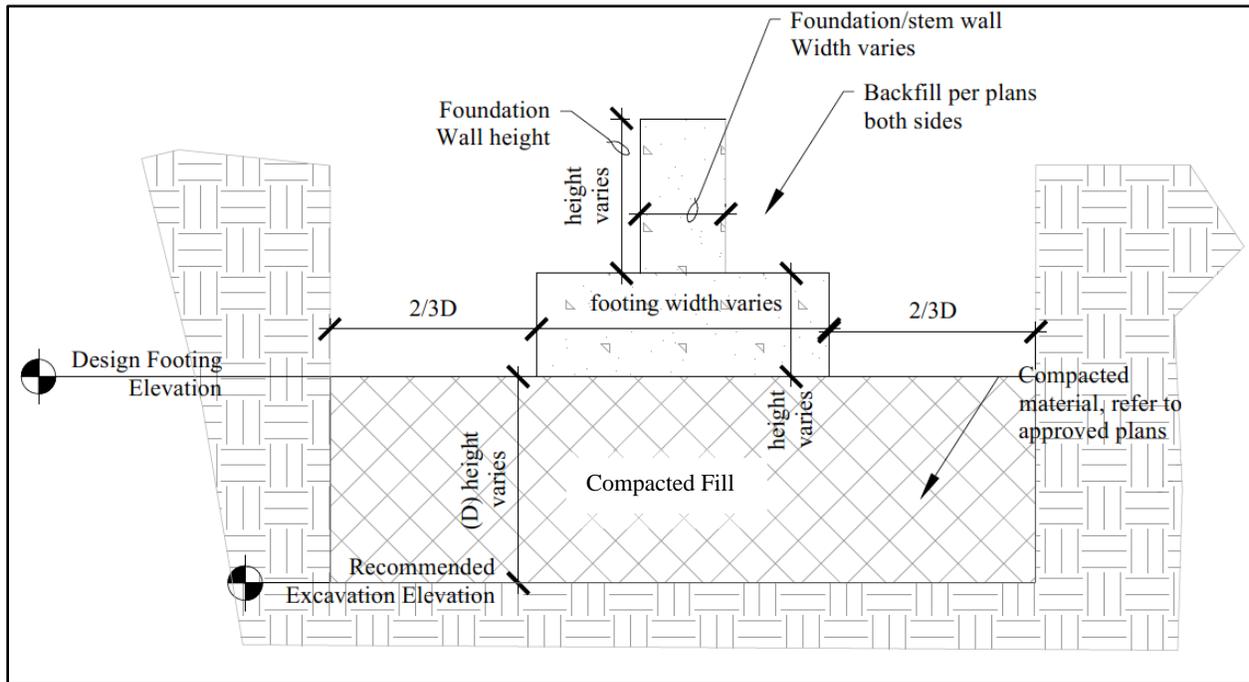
Foundation Backfill Detail for Soil and Aggregate Base Material
